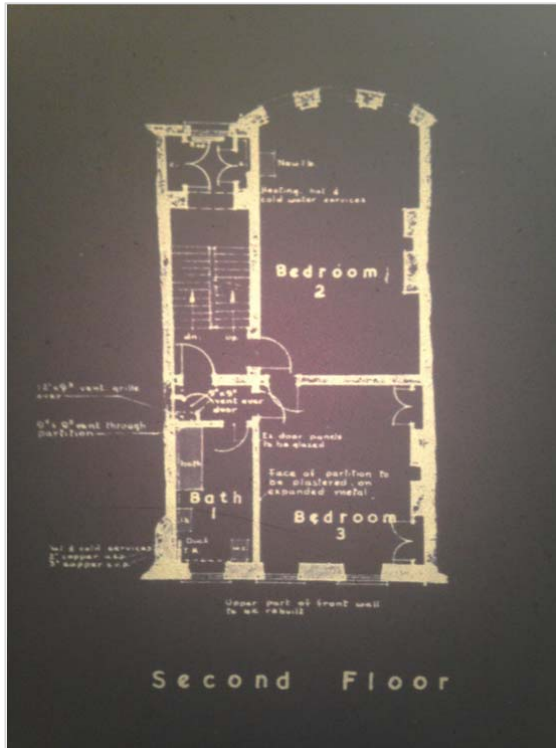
1950 Drainage Plan (Second Floor)²⁹
